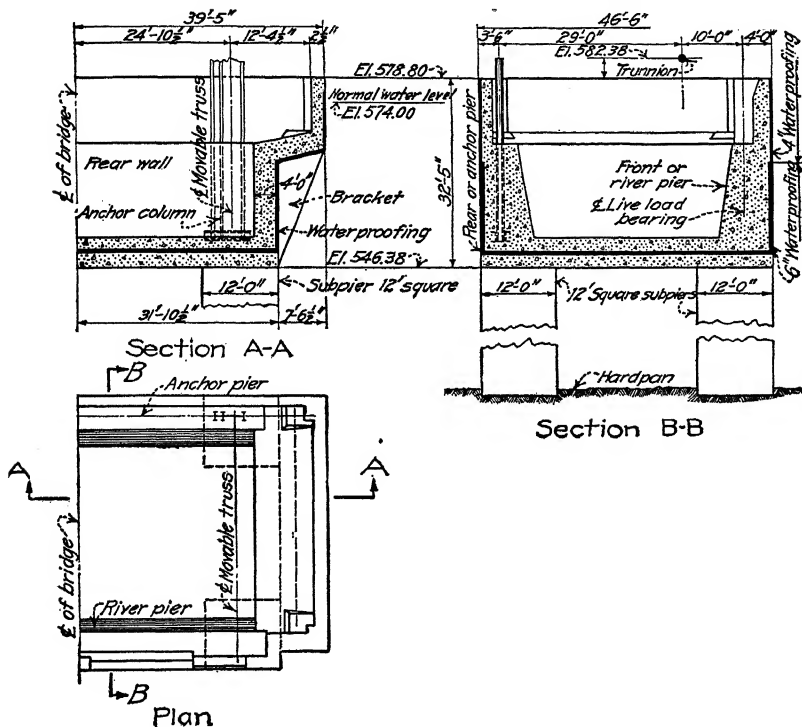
General design of Jefferson Avenue and Fort St. Bridge, Detroit; also the railroad bridge for the Detroit, Toledo & Ironton R. R. over the Short Cut Canal at Detroit.
